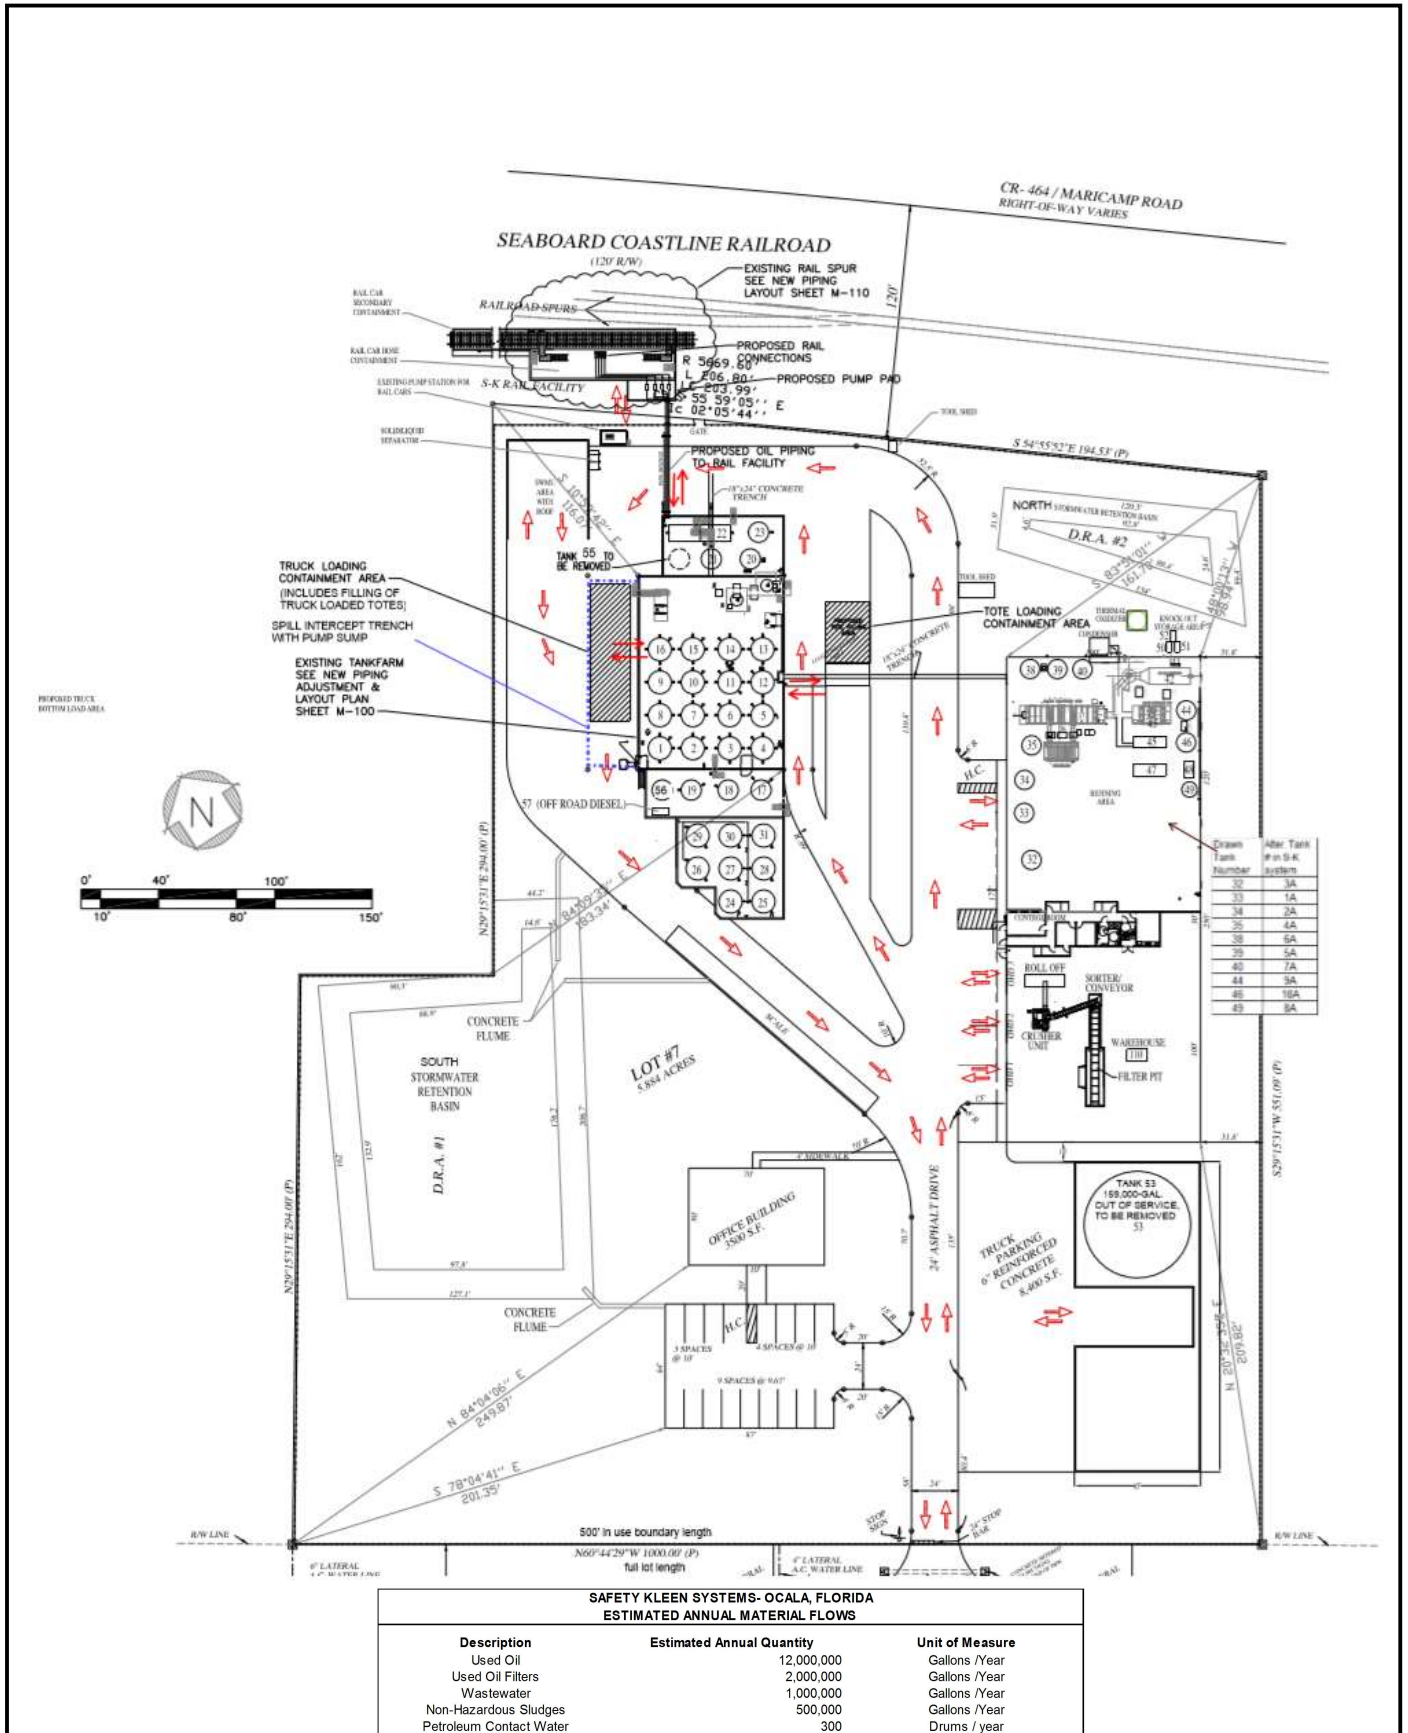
SITE PLAN AND OUTGOING MATERIAL AND WASTE TRAFFIC PATTERNS
